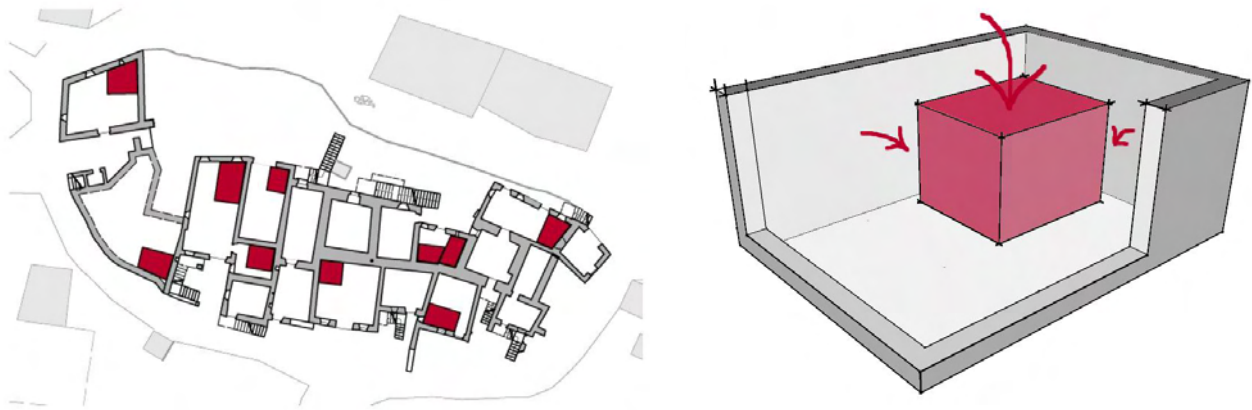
Layout of insertions in the plan and conceptual schema of the design approach
